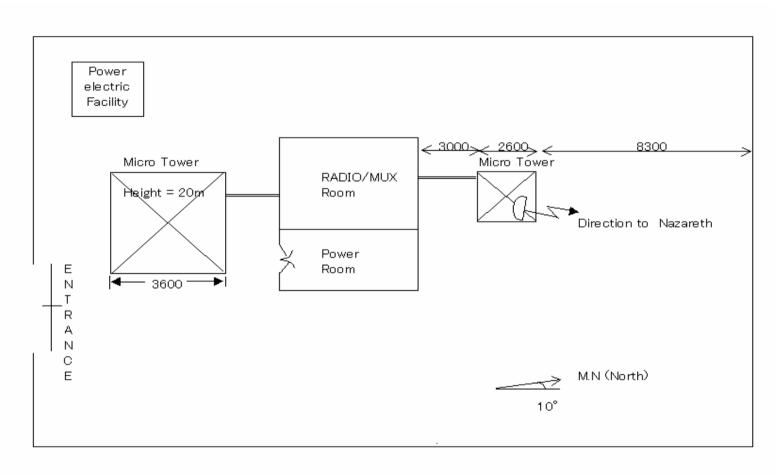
(1/2) ADAMA WEST MW Rep. Building Layout
